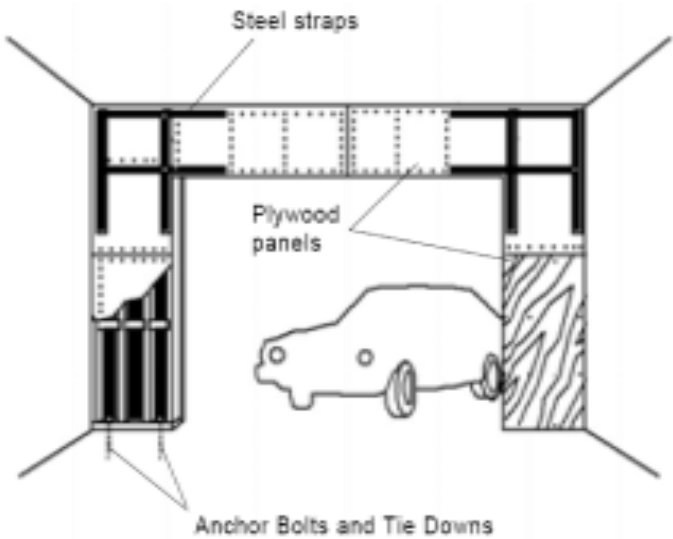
Bracing garage walls. If your house has a room over the garage, the garage walls may not be strong enough to hold up during an earthquake unless they are braced with plywood panels and steel straps.
